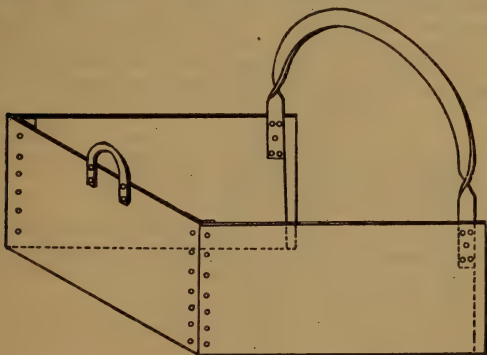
C. Sketch Showing Steel Plate Shield Employed in Laying Sewer Pipe.
